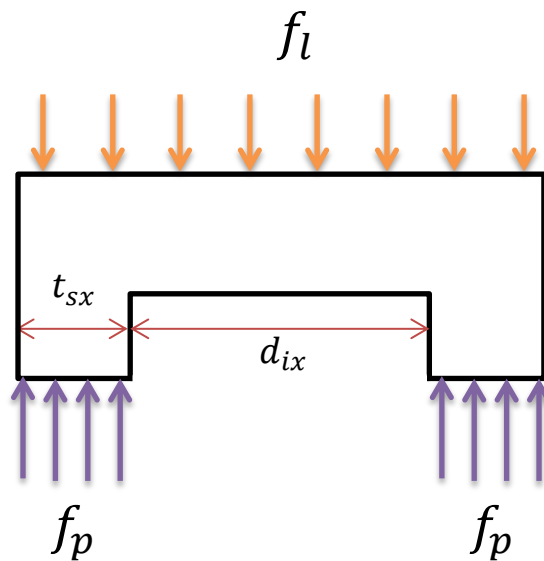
Stress Parallel to Transverse Reinforcement within the Concrete Wall of Hollow Rectangular Columns with One Layer of Transverse Reinforcement
